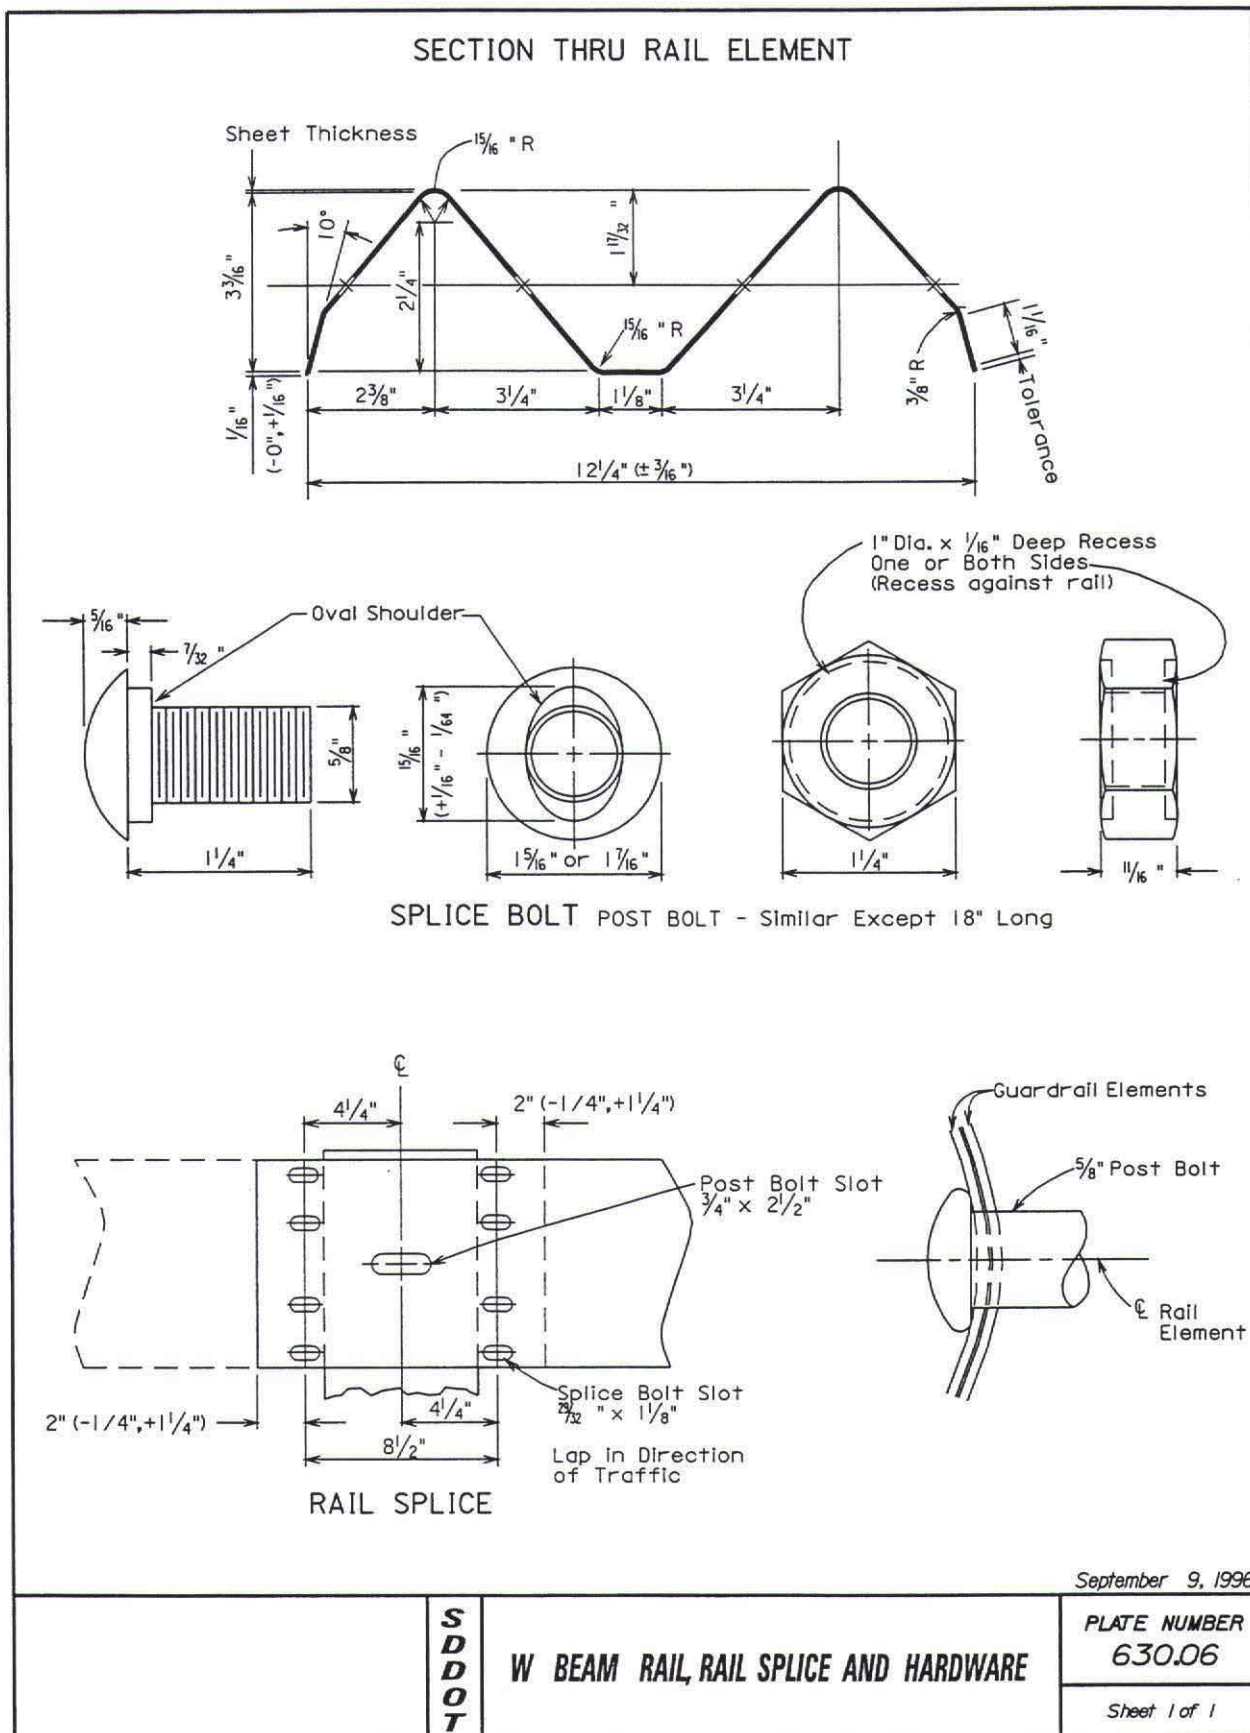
Cable Guardrail to W-Beam Transition Design Details (Continued)
